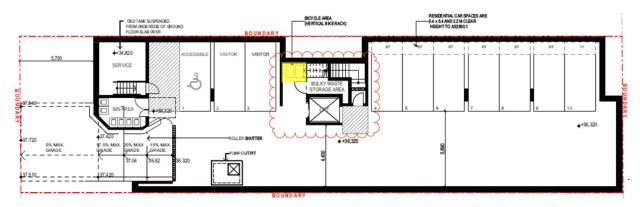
Parking layout within basement level (Bicycle area highlighted in yellow)
